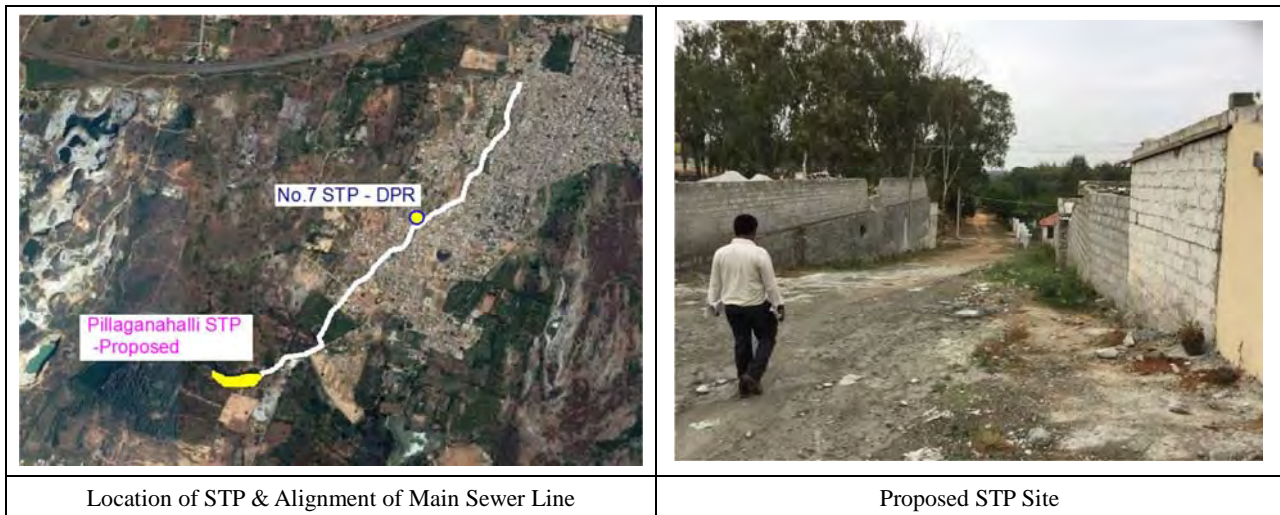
Location of No.7 STP and Alignment of Main Sewer Line
